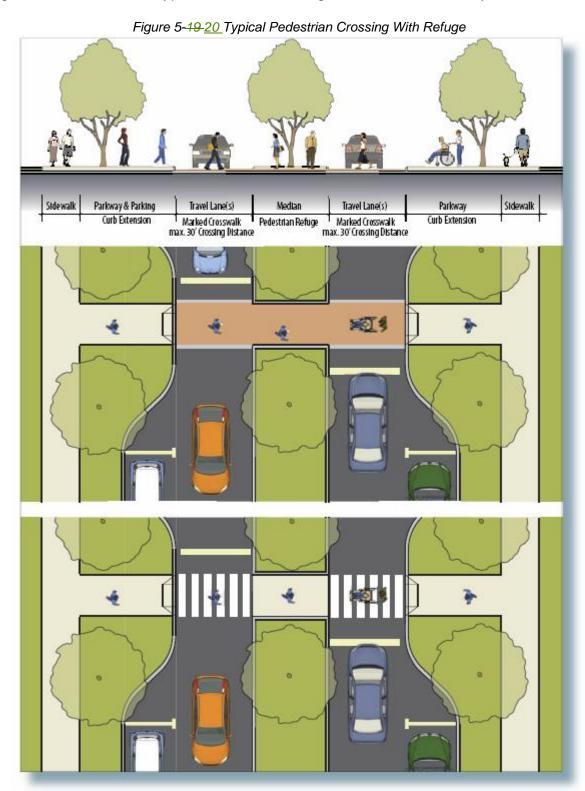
shows a typical crosswalk configuration for a Street Layout with median.
